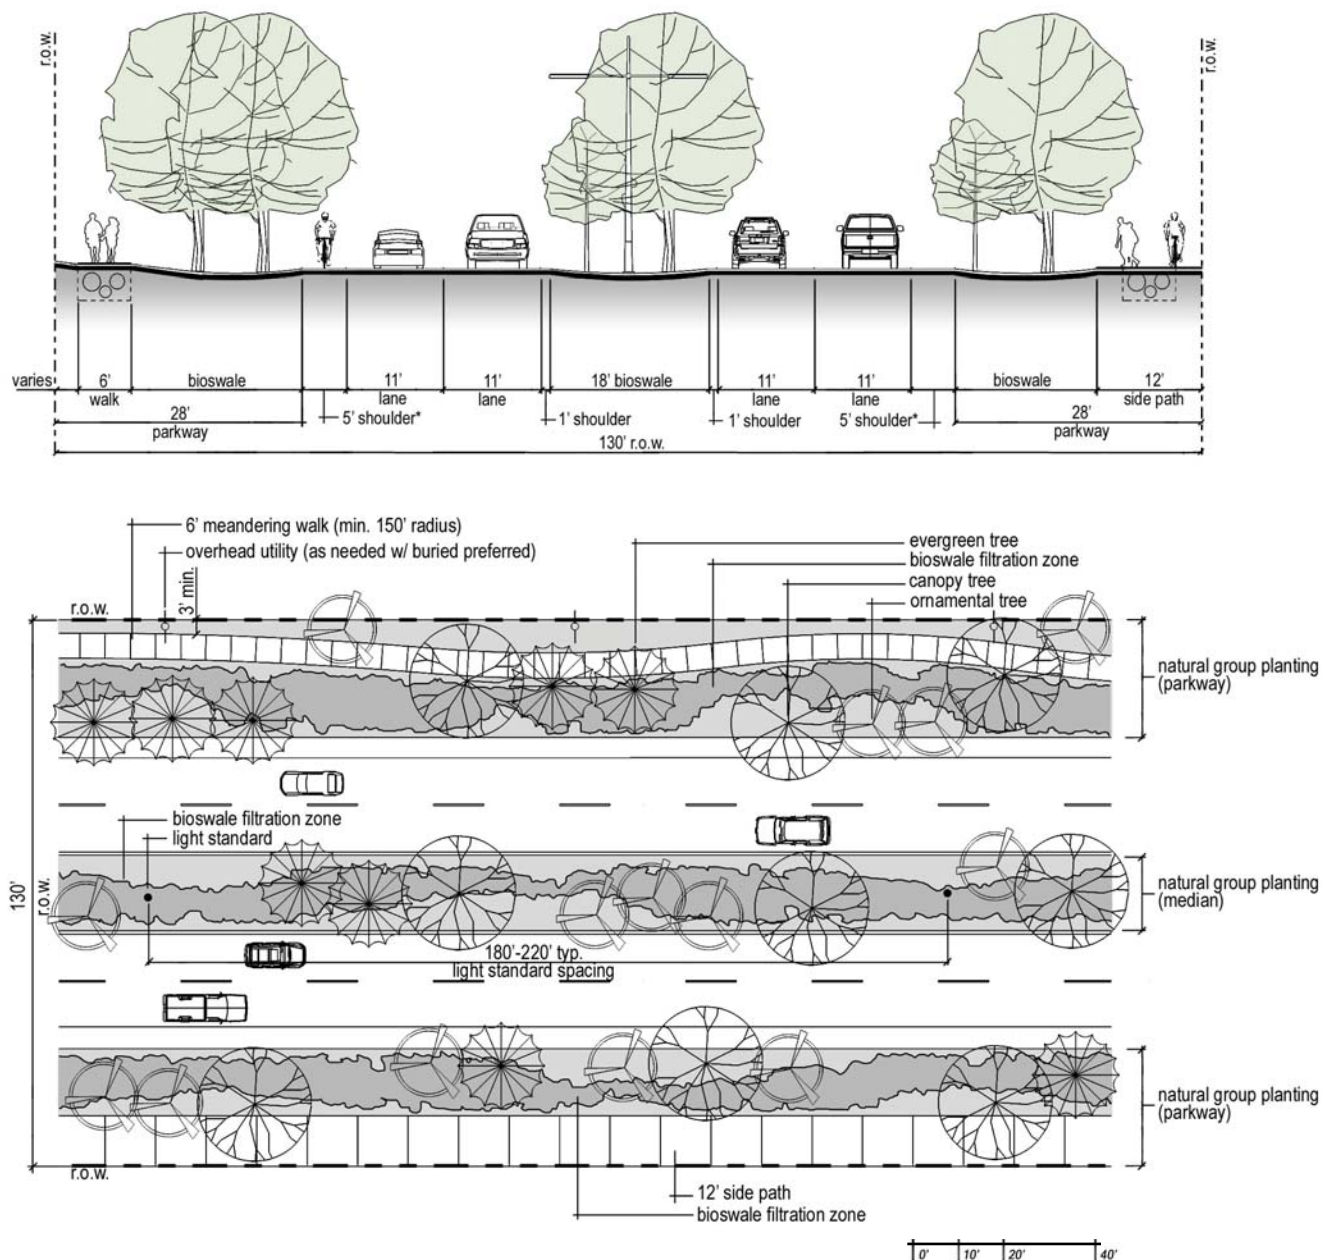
Typical Greenway Arterial Section & Plan: Rural Arterial
